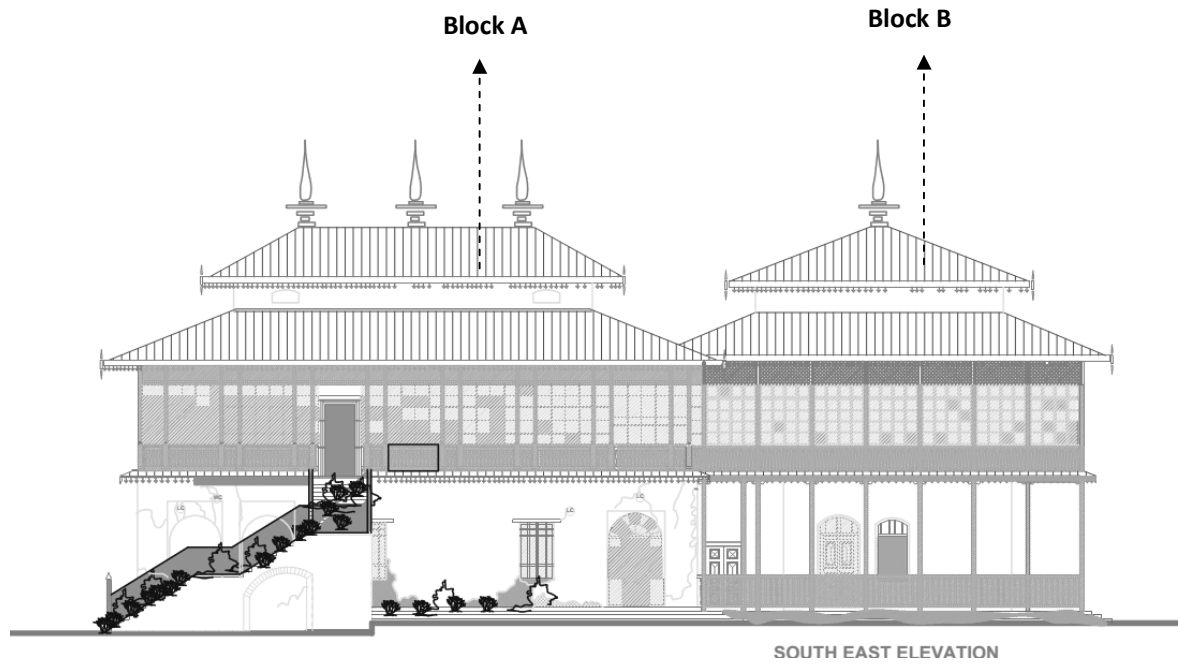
South East elevation drawing of the Palace building (Drawn by – the author August 2017)
